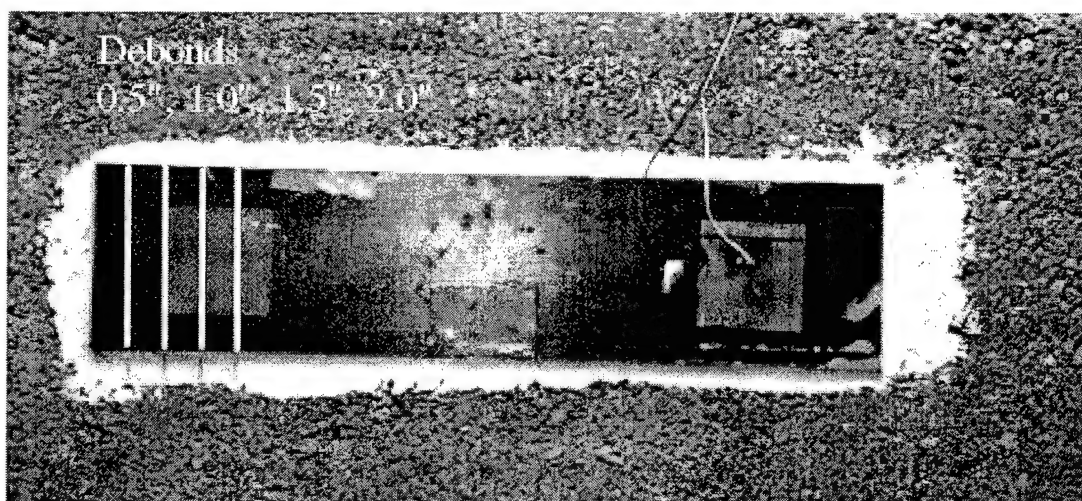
Concrete block with bonded graphite reinforcement, showing PE sensor at right.
